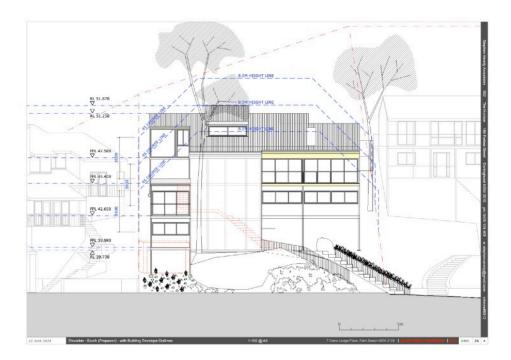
Proposed Short Section Building Envelope Lines (Stephen Varady Associates)
